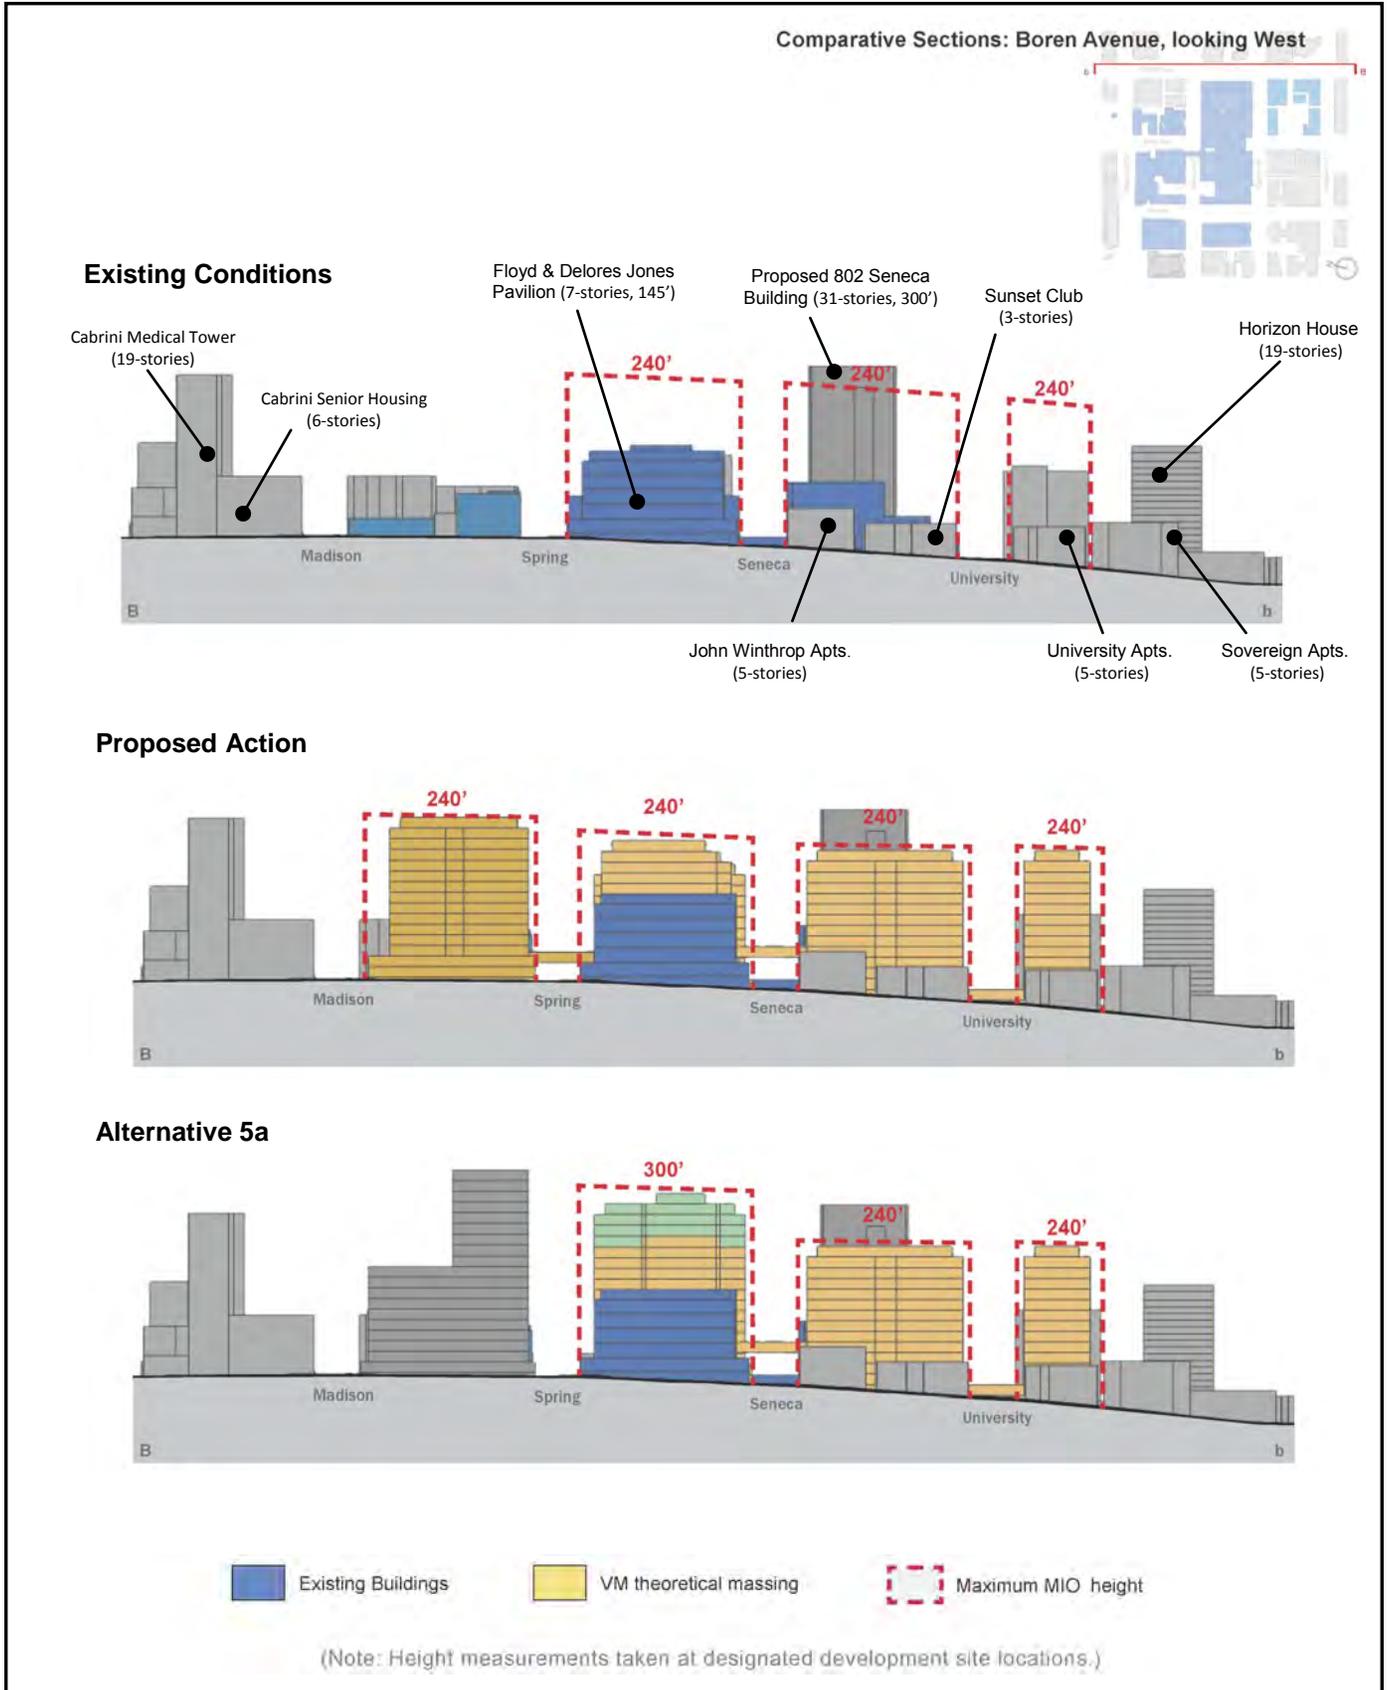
depicts a street cross-section along Boren Avenue (key map depicts the location and Figure 3.6.2-3 depicts a street cross section showing a northerly view of the 1000 Madison Block, as seen from Madison Street. The purpose of these cross-sections is to show the height relationship of proposed campus development under the Proposed Action and Alternative 5a to the maximum allowable development envelope that is possible – either as part of the VMMC MIO or development that may be authorized by zoning – within the context of existing offsite development. Each cross-section is described later in this section.
